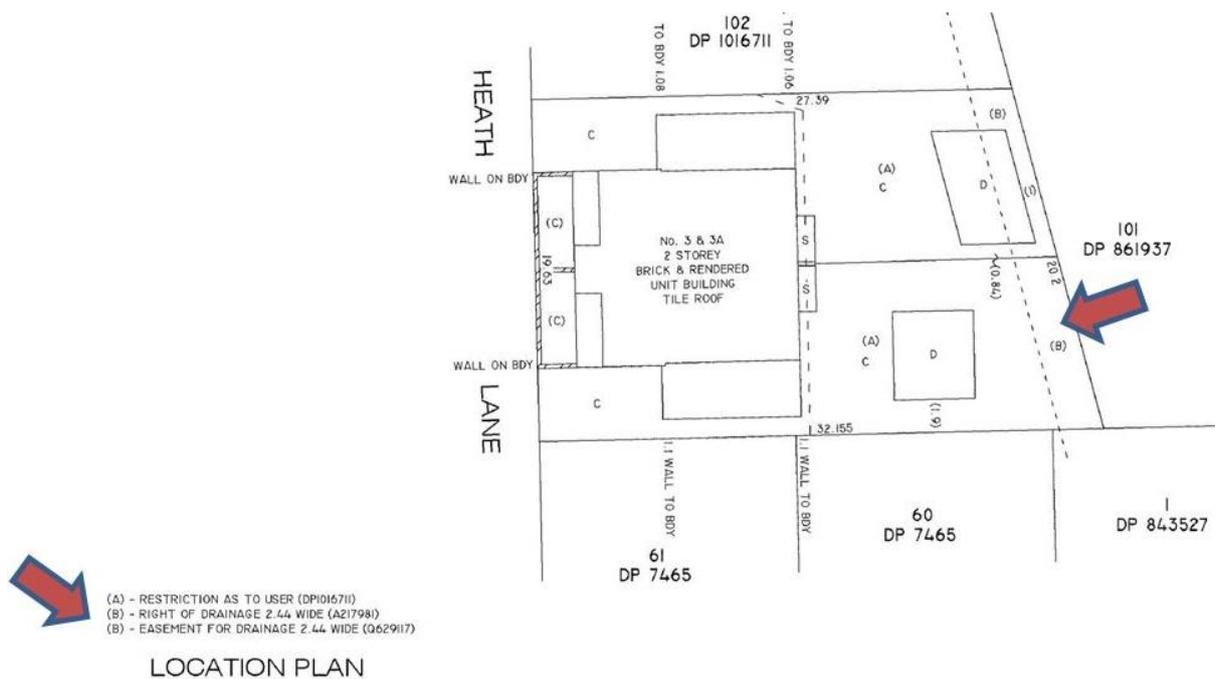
Detail from SP 91335, showing “Right of Drainage” and “Easement for Drainage”, both 2.44 m wide.
